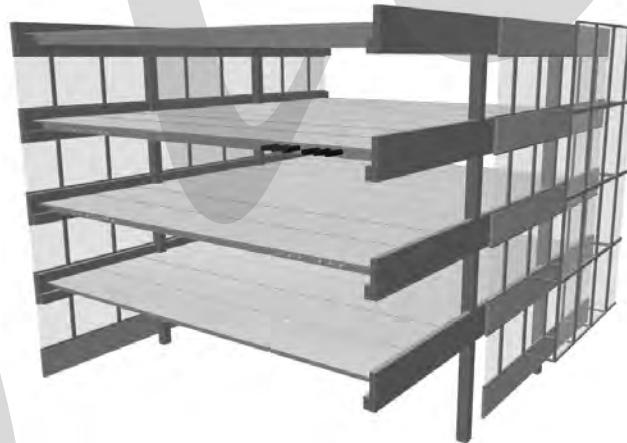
Schematic view of a modern construction concept with large, open internal spaces
